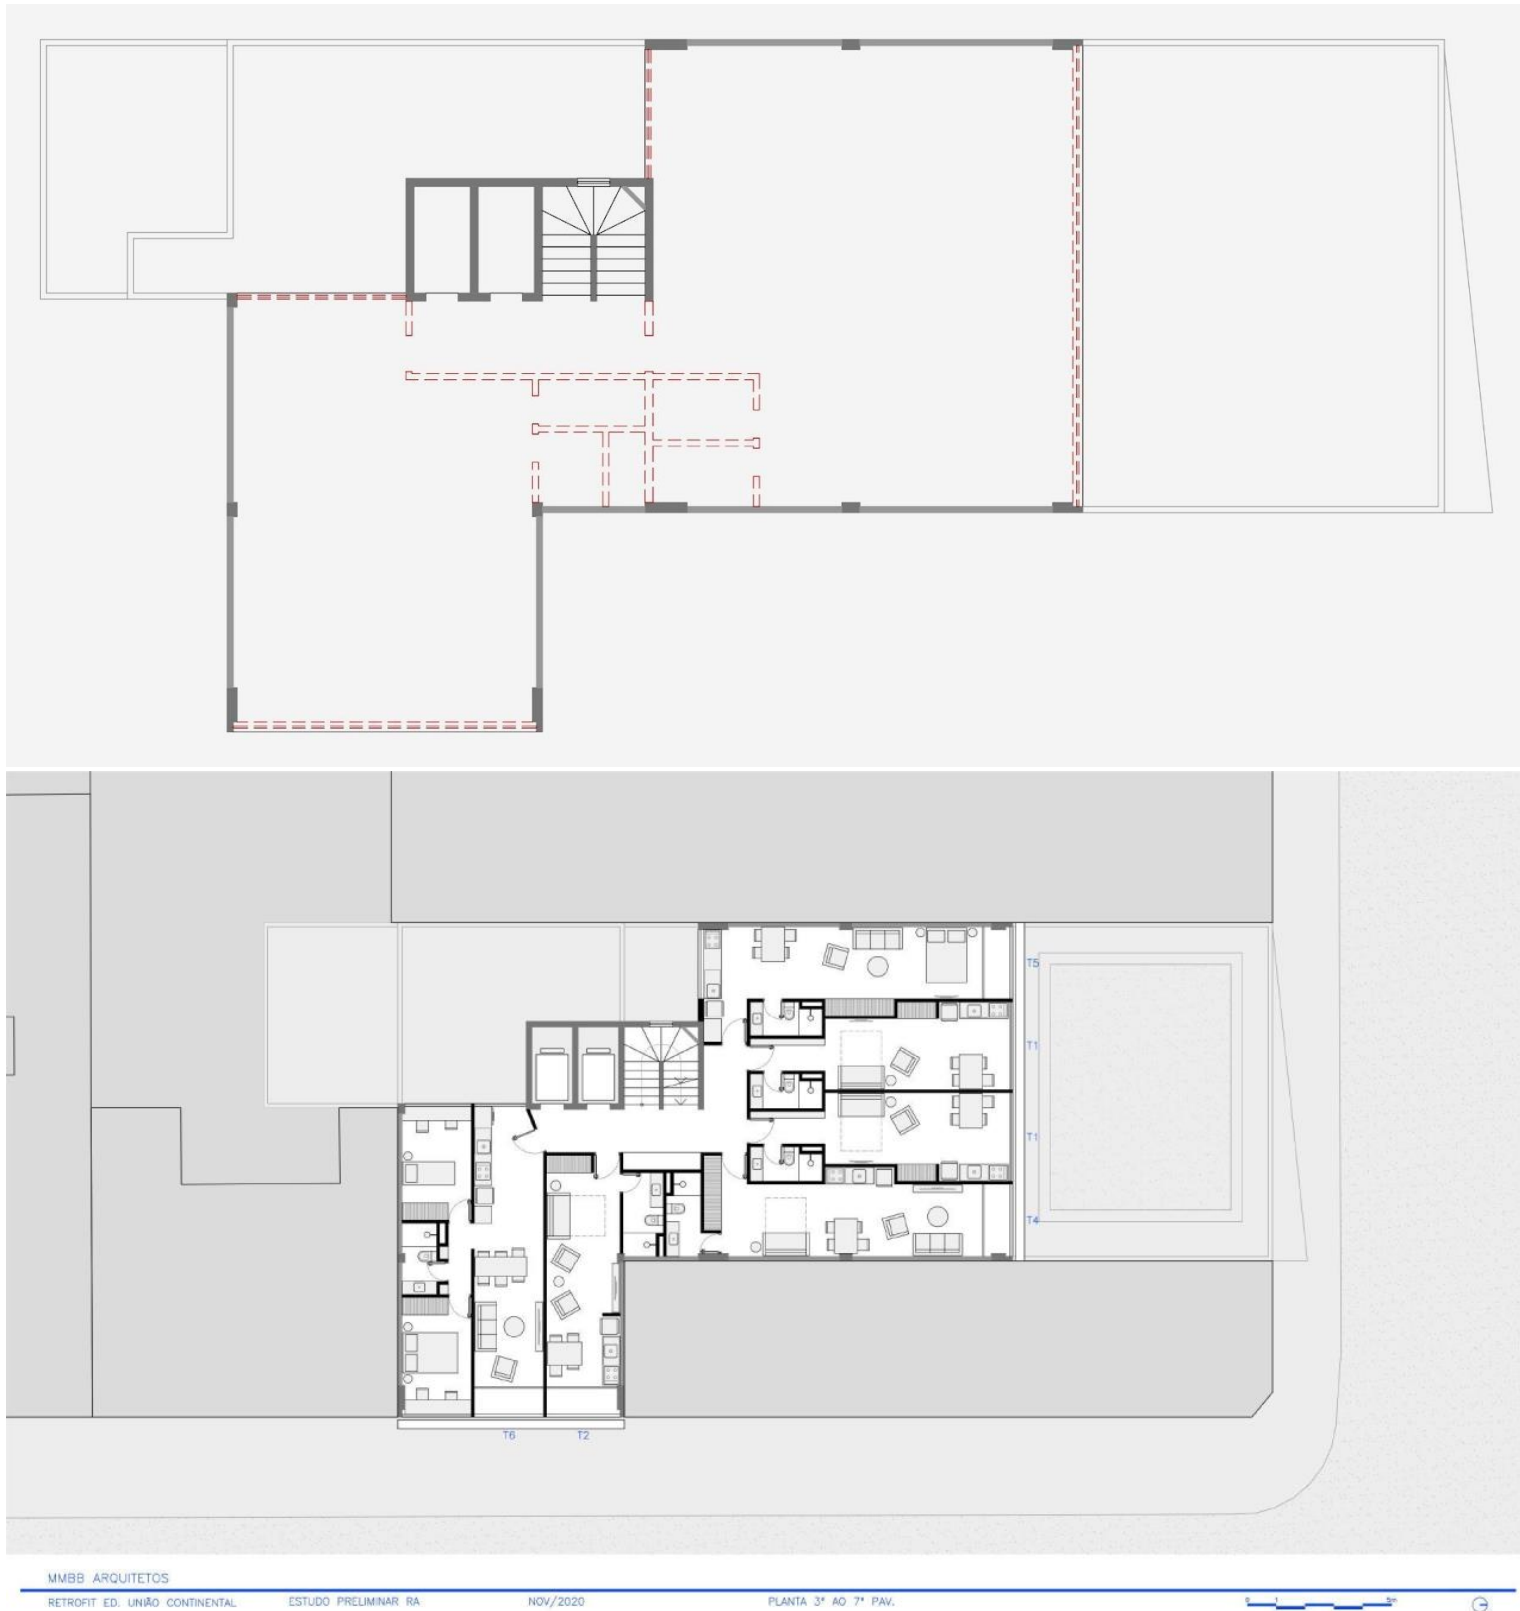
União Continental Building, typical floor plan: to retain/demolish and intervention. Source: MMBB Architects, 2020.
